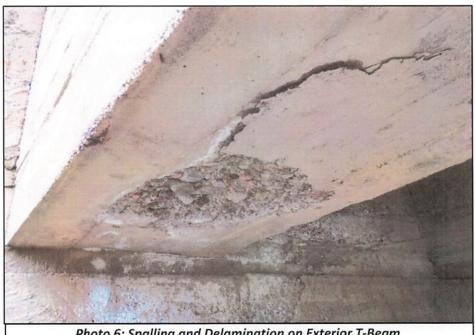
Spalling and Delamination on Exterior T-Beam
